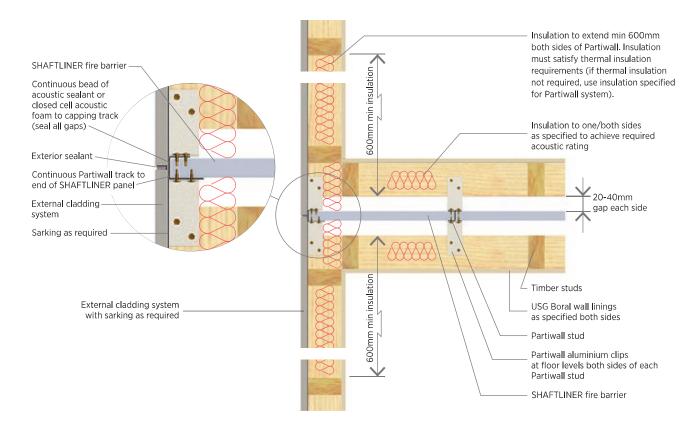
Clad Wall Junction Detail - FRL 60/60/60
